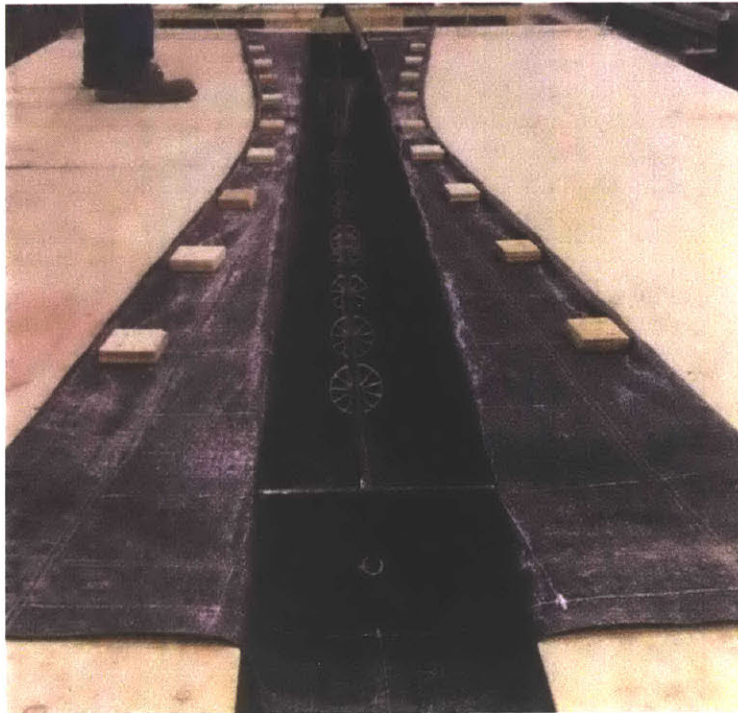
Photo from West (2017) of fabric formwork with reinforcement before the pour
